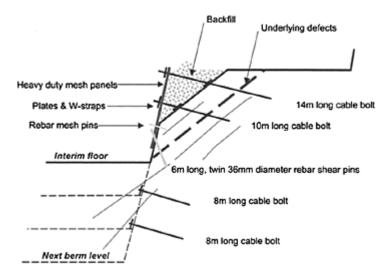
Ramp recovery and batter reinforcement using cable bolts and shear pins.
